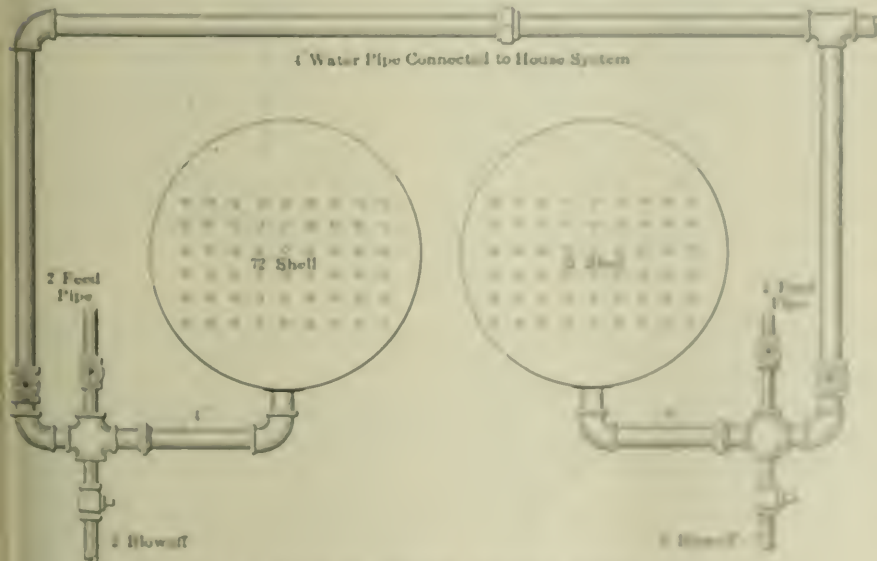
SHOWING FURTHER MACHINE CONNECTIONS
